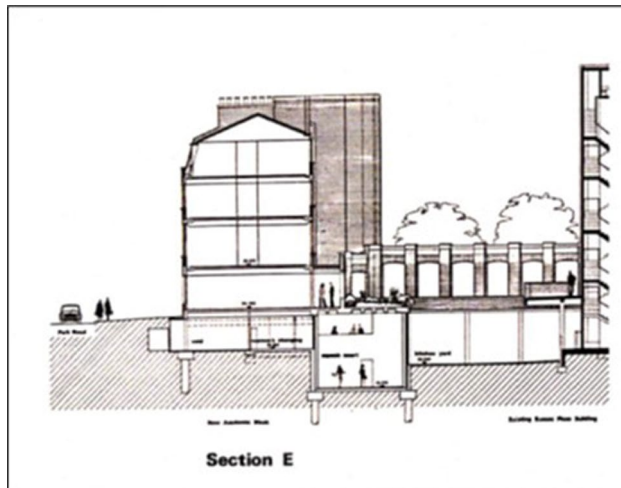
Initial draft sketch showing the side profile of the design for the Park Road building and how it would link with the original Sussex Place building (Westwood Piet & Partners, 1980).
